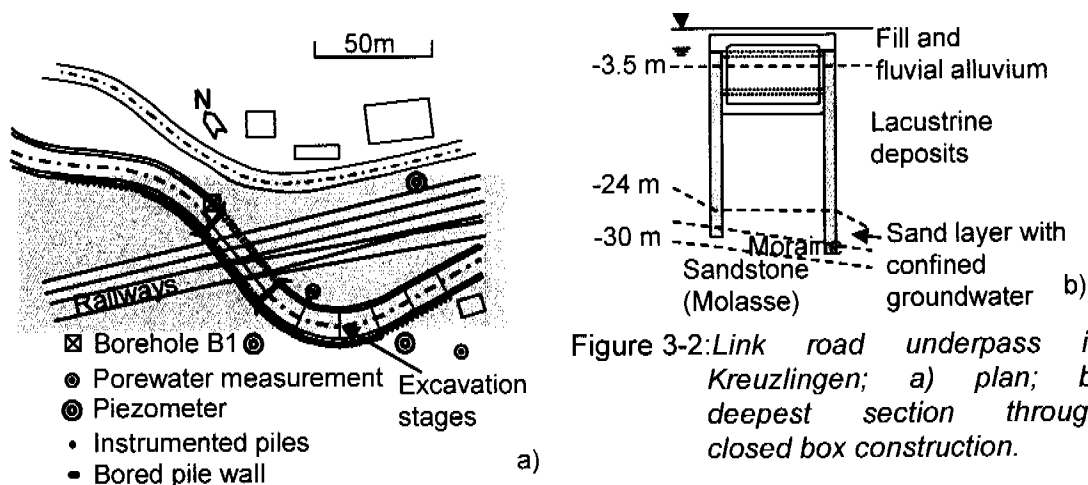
Link road underpass in Kreuzlingen; a) plan; b) deepest section through closed box construction.
